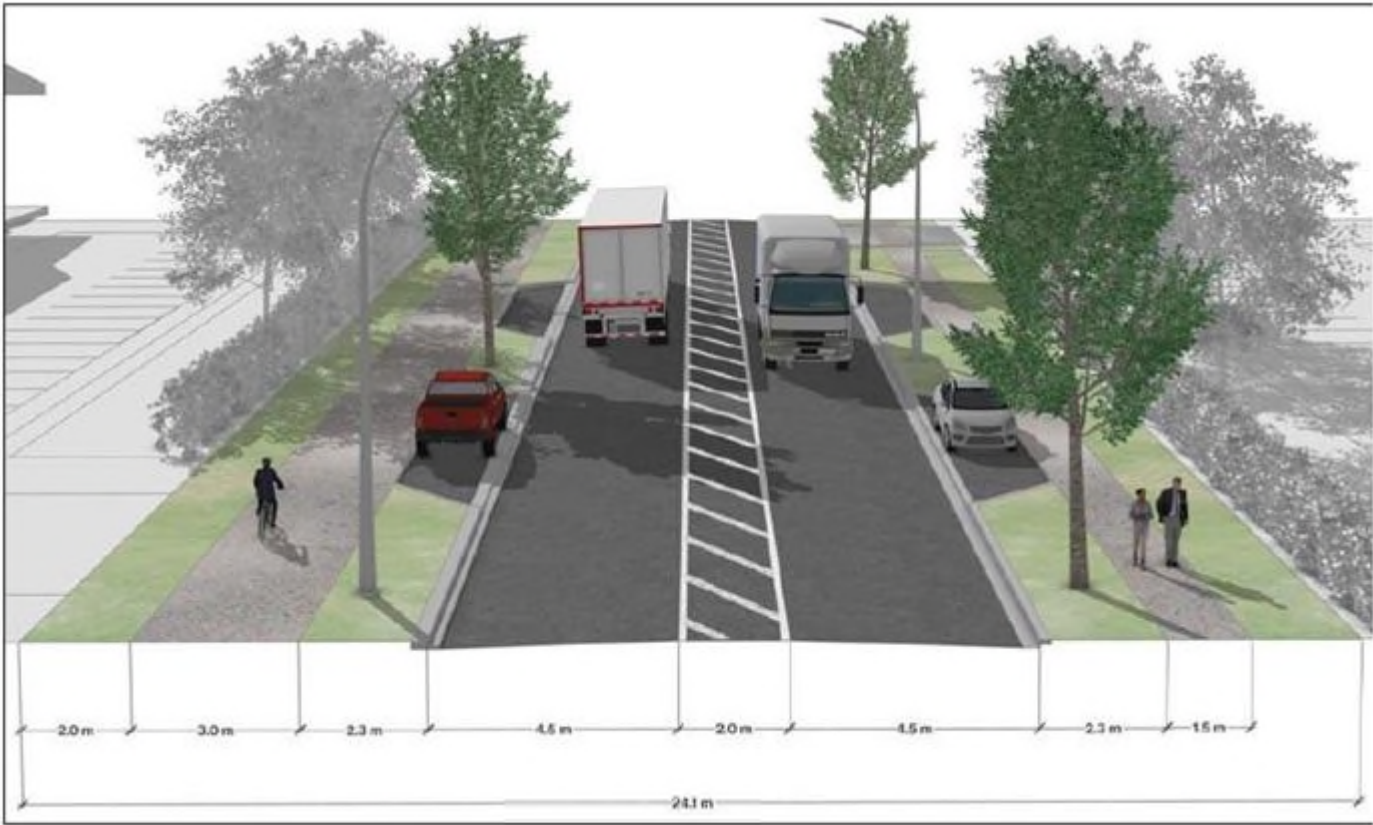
c: Indicative Typical Cross-Section of the Te Rapa Structure Plan Spine Road (Collector)
